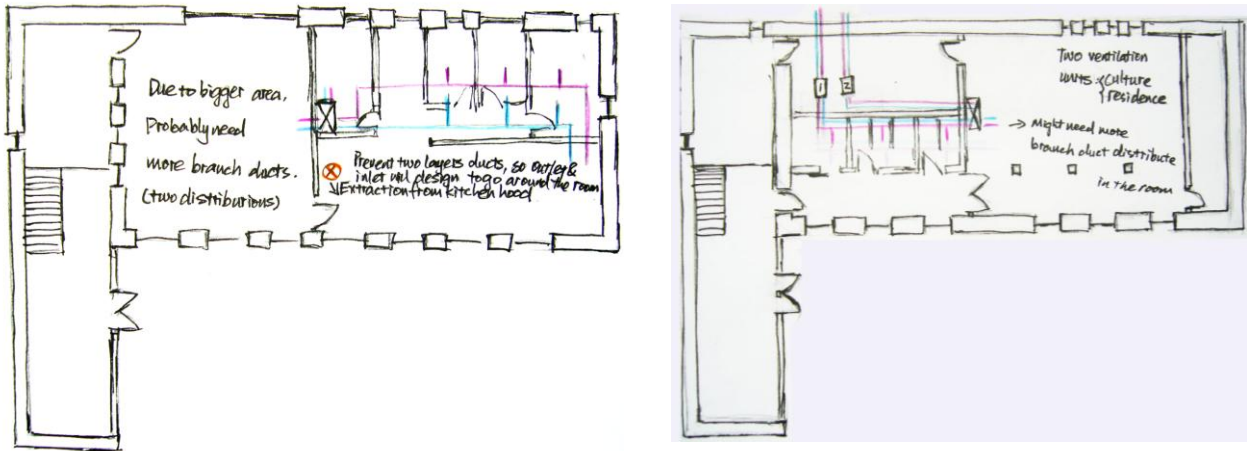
Rough sketches for the ventilation ducts distribution in the building (ground floor plan on left, basement plan on right).
